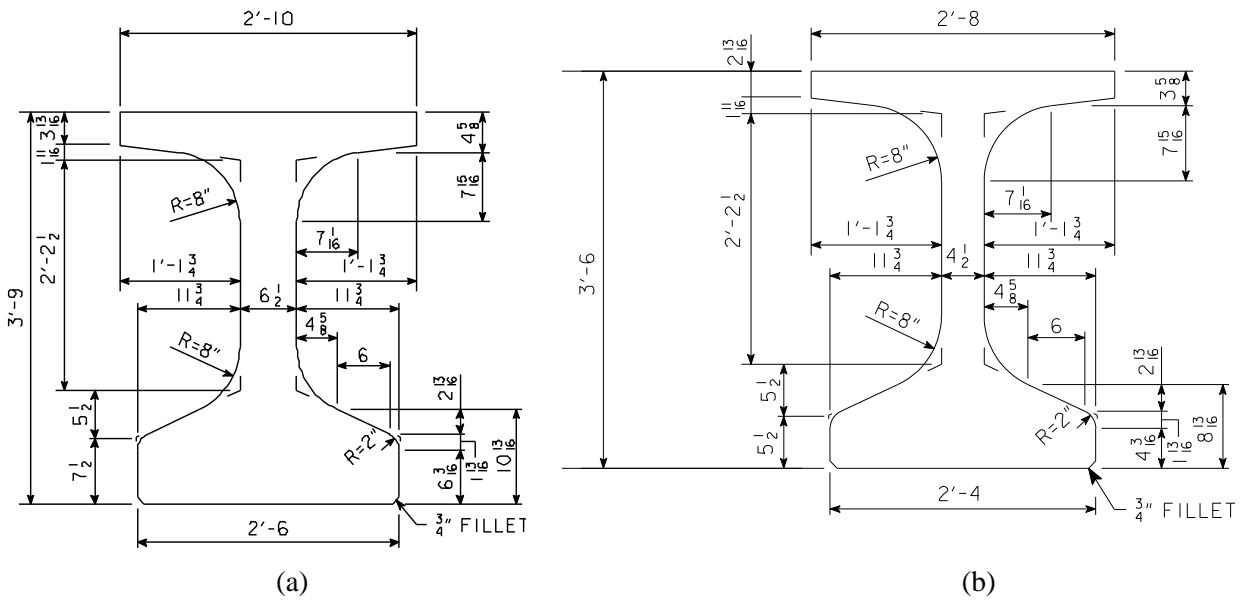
(a) Standard Iowa Bulb Toss (b) Modified section for UHPC Girder
